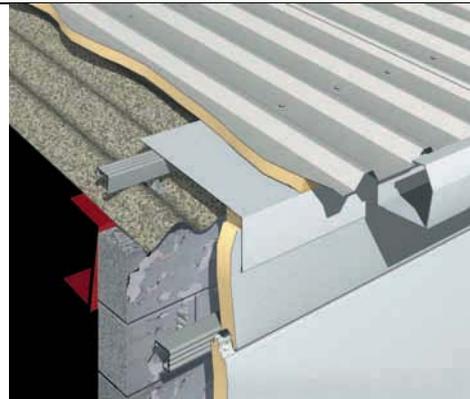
Over roofing of asbestos sheet and over cladding of brick using Corus Composite PUR panel
